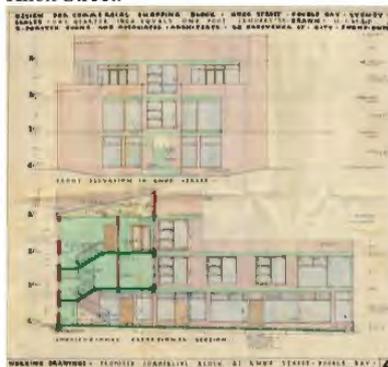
Evan's Knox Street elevation and section of the proposed "shopping block" at No 21 Bay Street.
